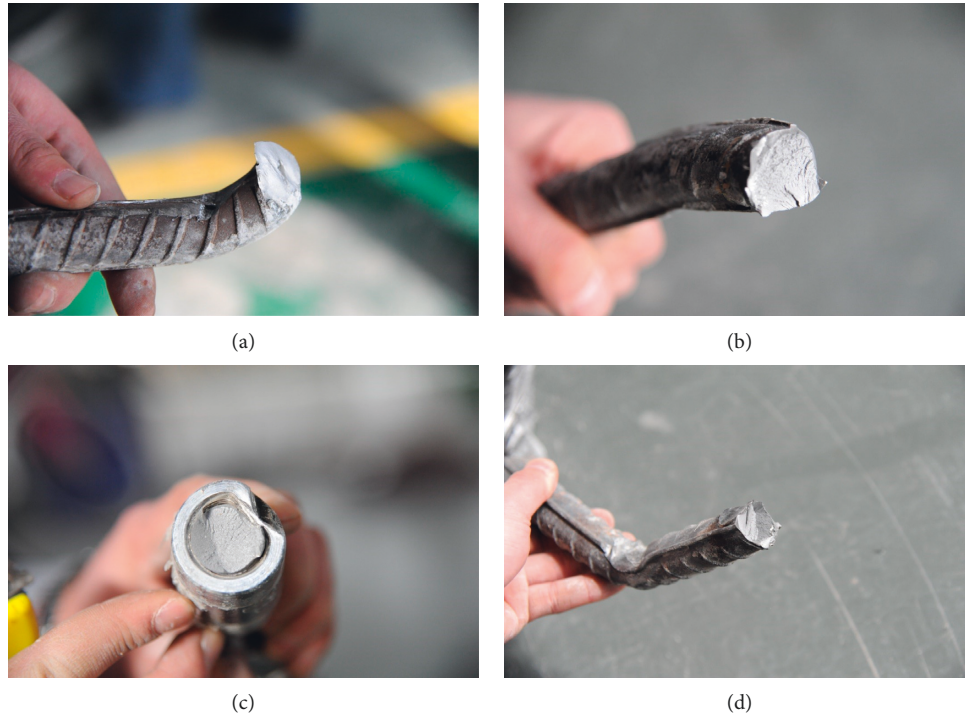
Cross section of broken reinforcement. (a) Shear section; (b) Tensile-shear section; (c) Tensile-compressive section; and (d) Bending section.
